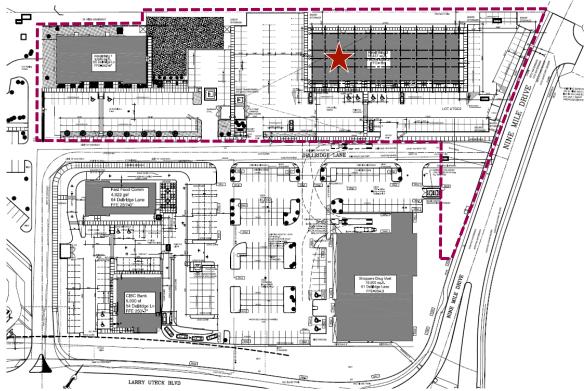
Site plan with property line indicated ((Source: Issued for Construction Drawings, Dated July 23, 2013) FOWLER BAULD & MITCHELL LTD.
